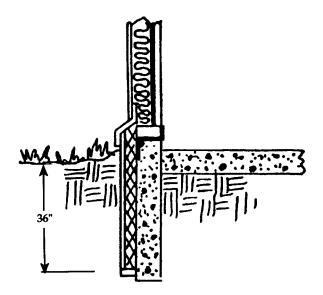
Perimeter insulation placed on the outside of a foundation, curtain, or stem wall must be protected to prevent rodent damage. Protection is required along the top and to a depth of at least 36 inches below the soil surface.
